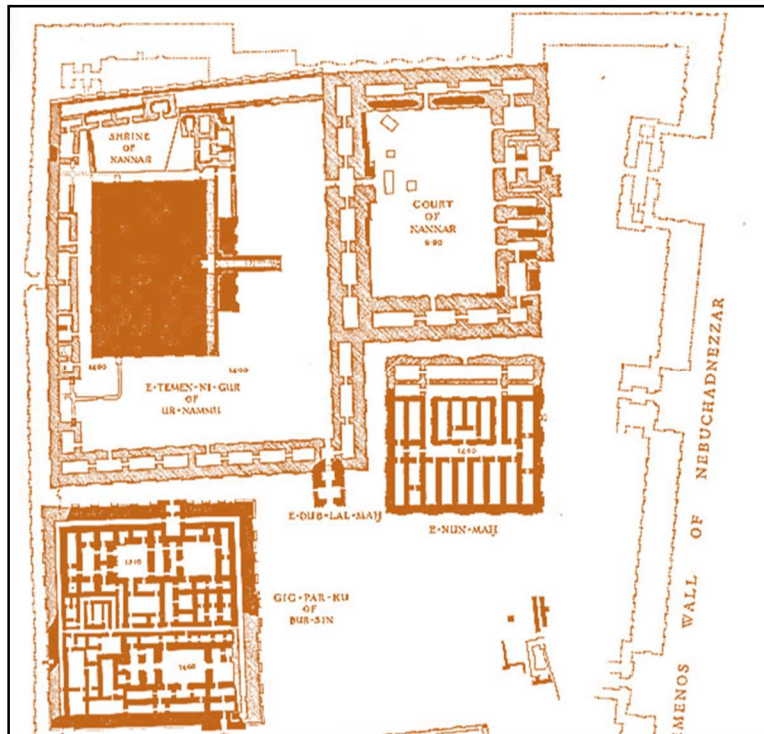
The Ur III ziggurat and the surrounding buildings at Ur (after Woolley 1939)
